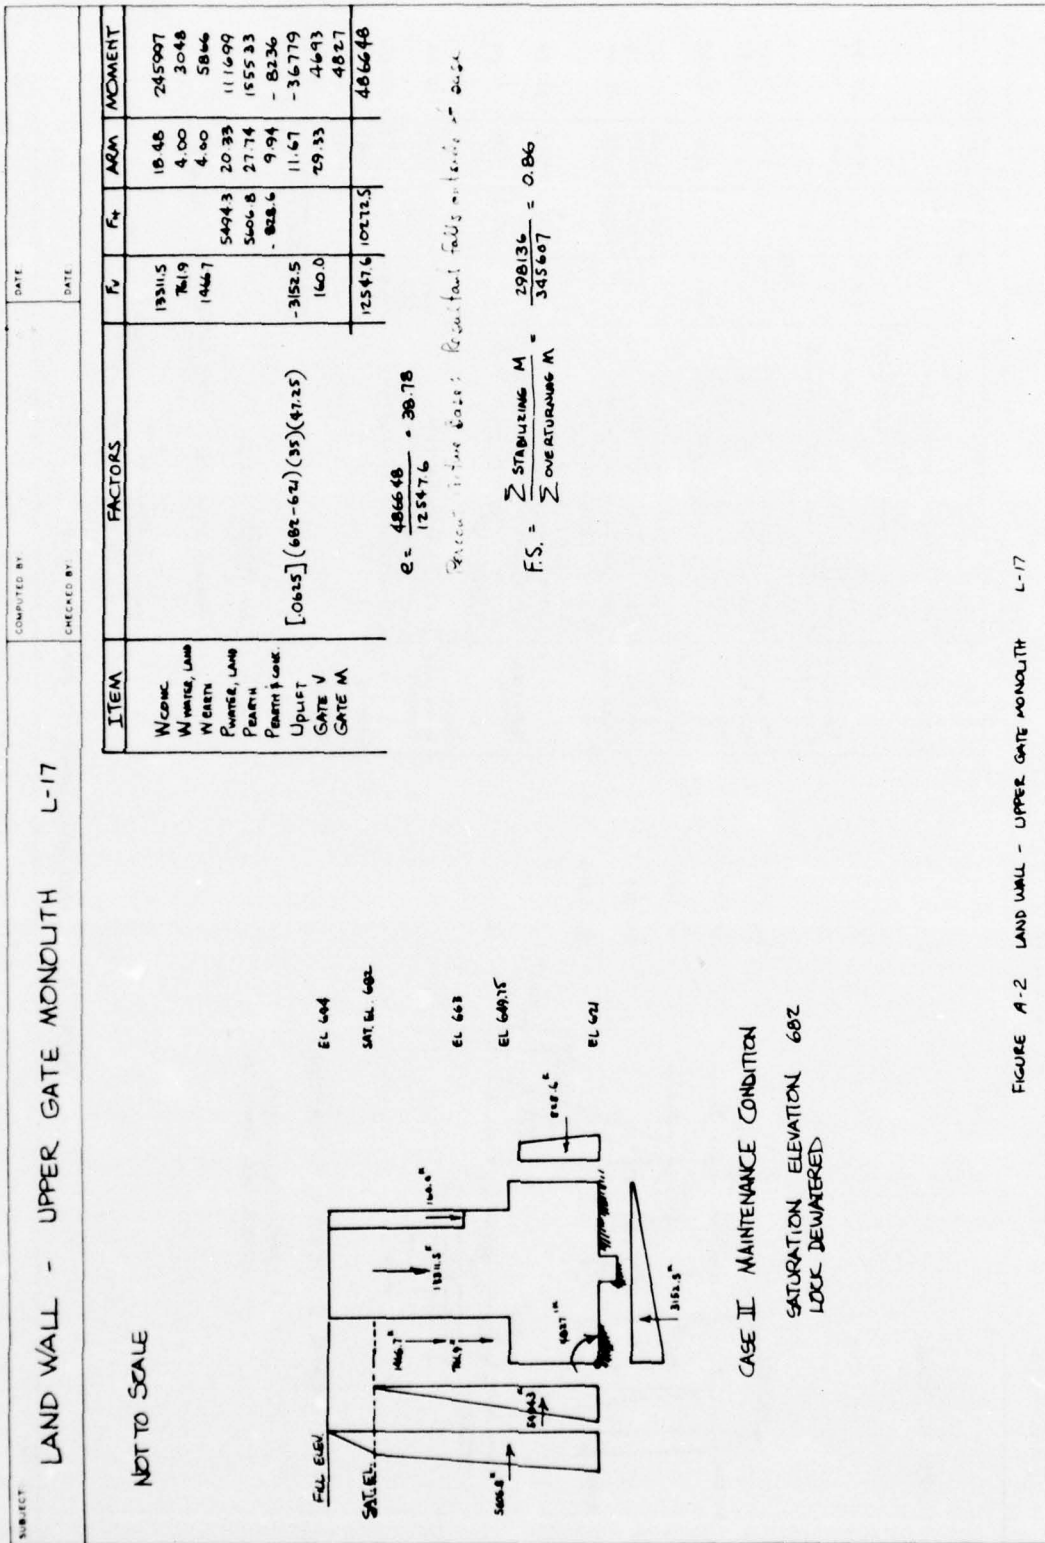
LAND WALL - UPPER GATE MONOLITH L-17
